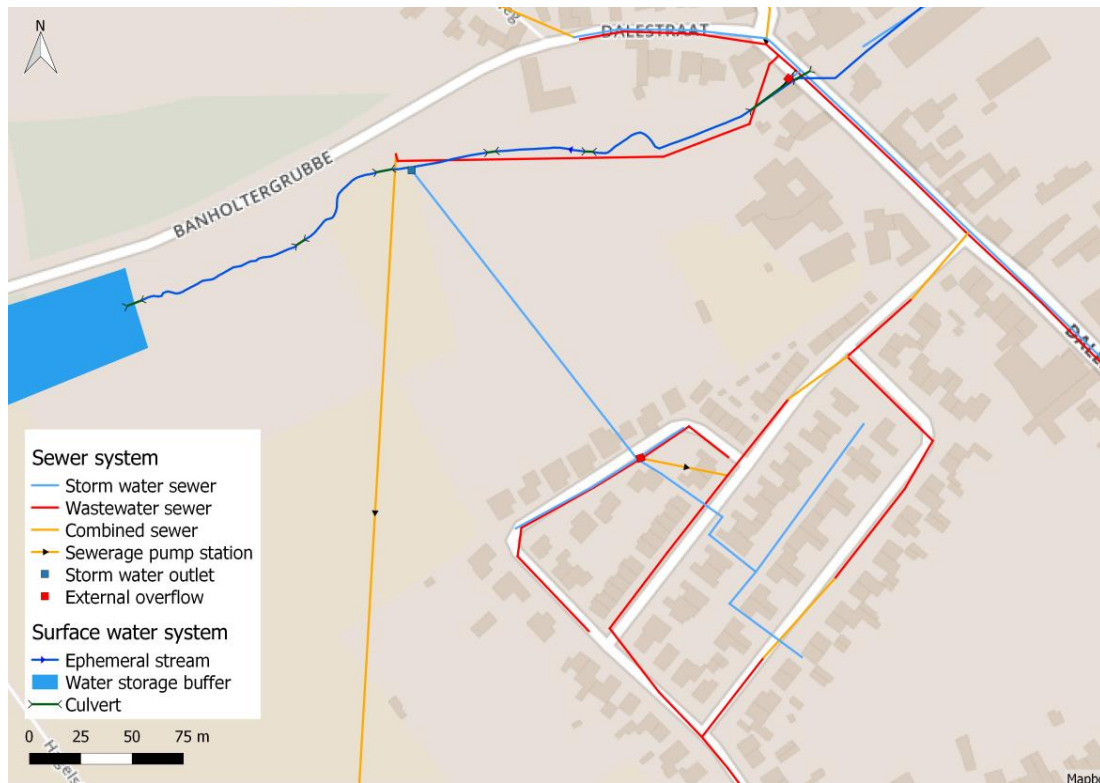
Urban drainage system around the Pastoor Engelenstraat in Banholt.
